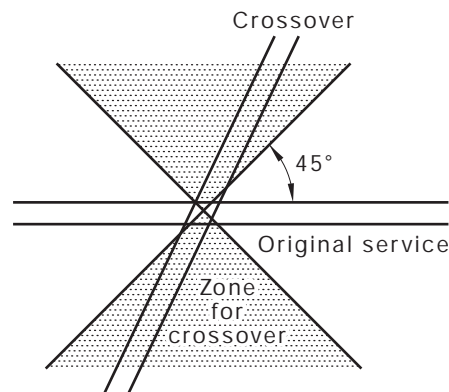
PERMITTED CROSSOVER ZONE FOR ELECTRICAL CABLES AND GAS PIPES
